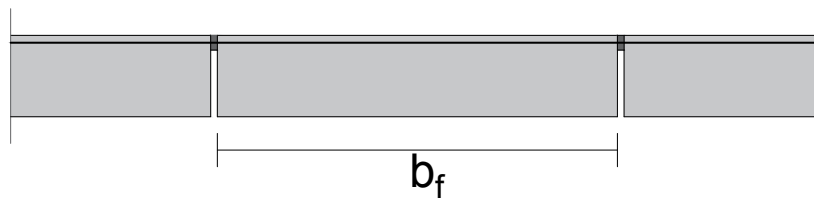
Transverse floor-to-floor connection by single prestressing at the top of the cross-section
